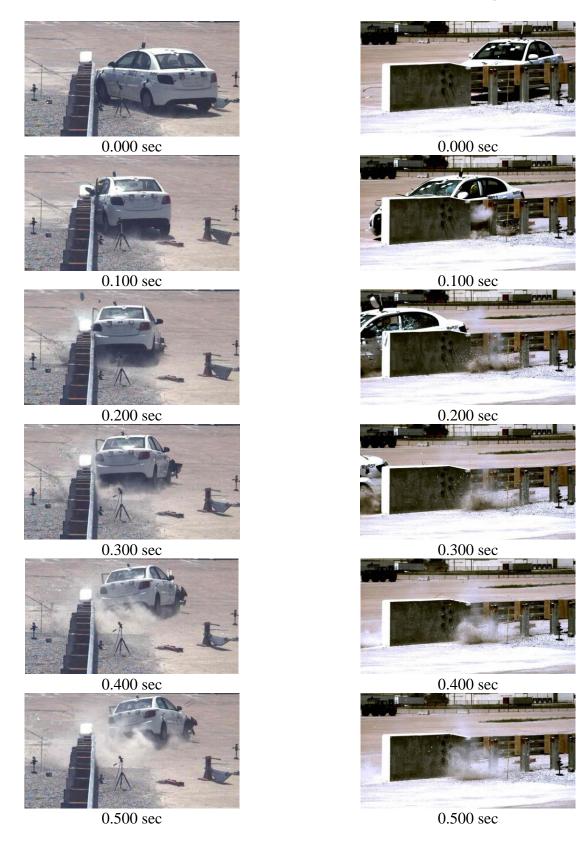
Additional Sequential Photographs, Test No. 34AGT-2
